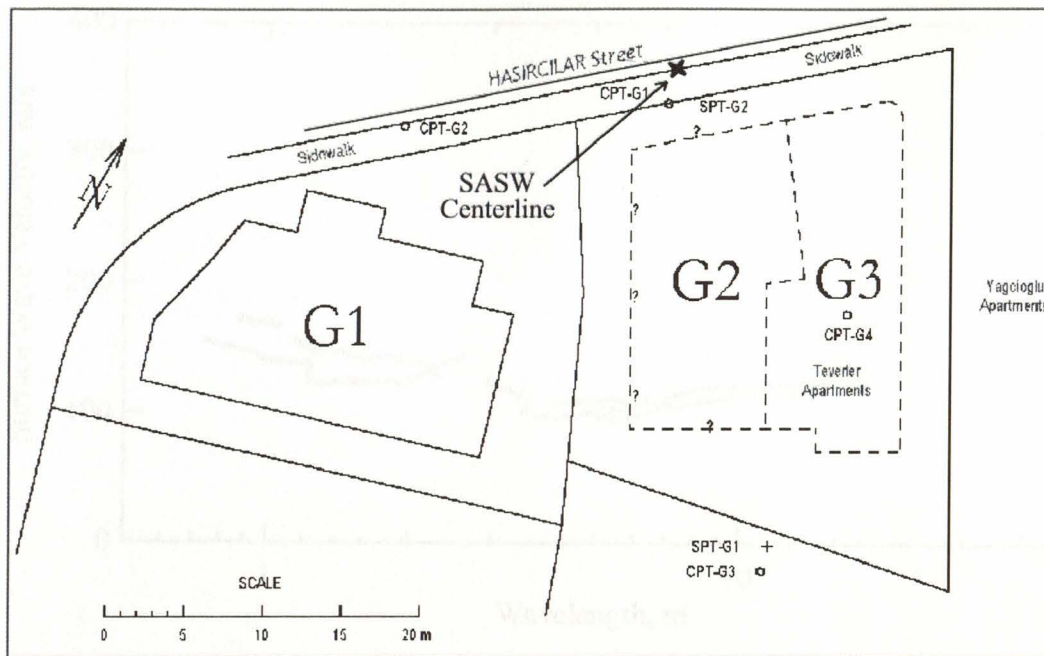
Plan view of Site G showing the location of one SASW centerline (modified from [www.eerc.berkeley.edu/turkey/adapazari](http://www.eerc.berkeley.edu/turkey/adapazari)).
